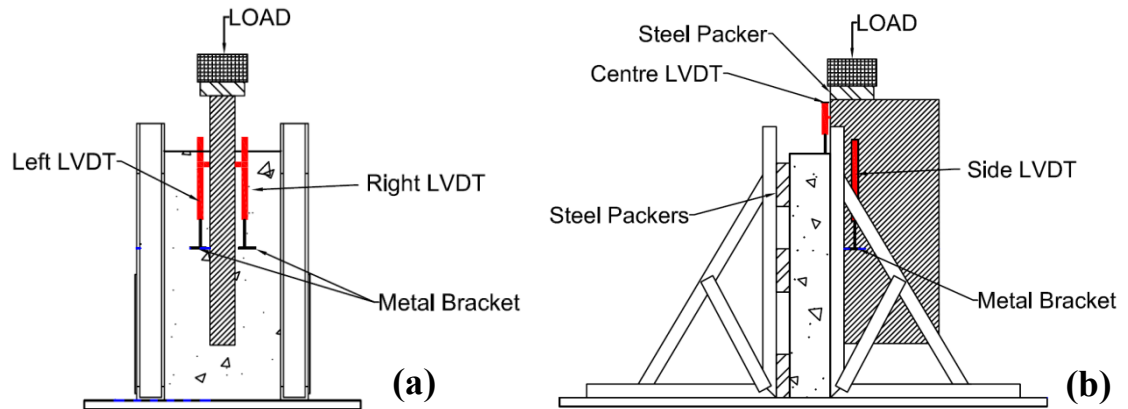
Schematic drawing:(a) front and (b) elevation views of test set up
